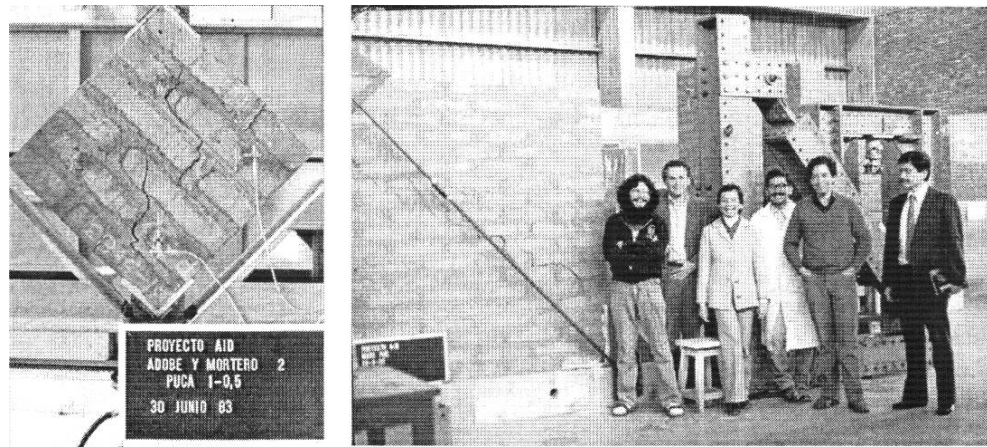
Lateral load deformation of static test of unreinforced and reinforced adobe wall's panels in PUCP (Blondet, Garcia & Loaiza 2003).
